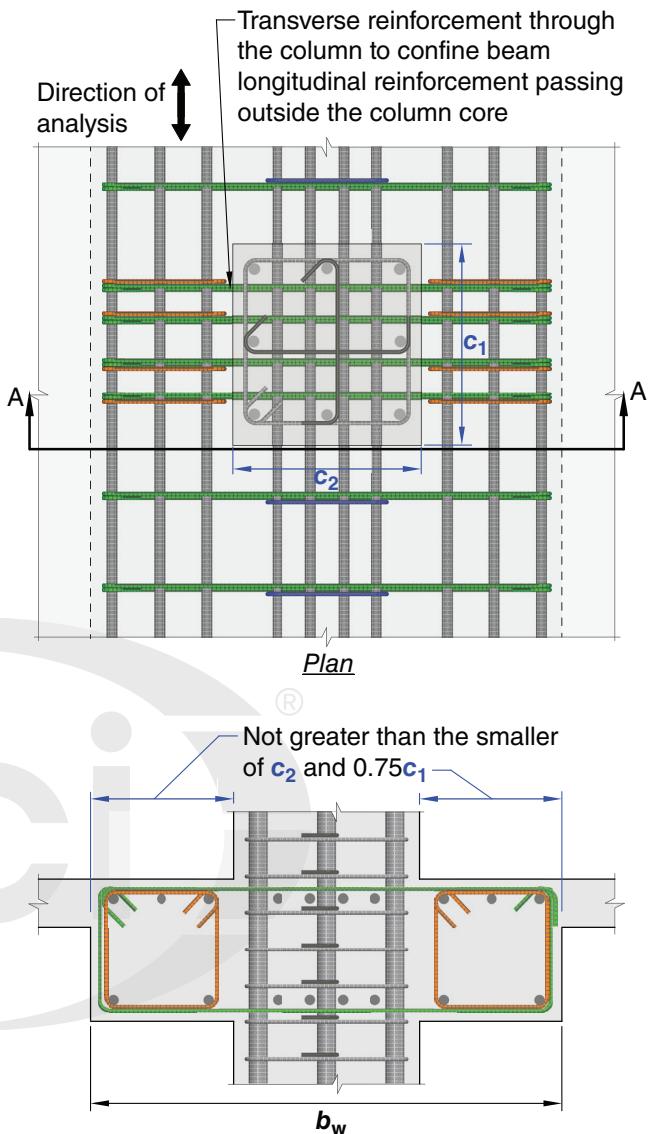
Maximum effective width of wide beam and required transverse reinforcement.
